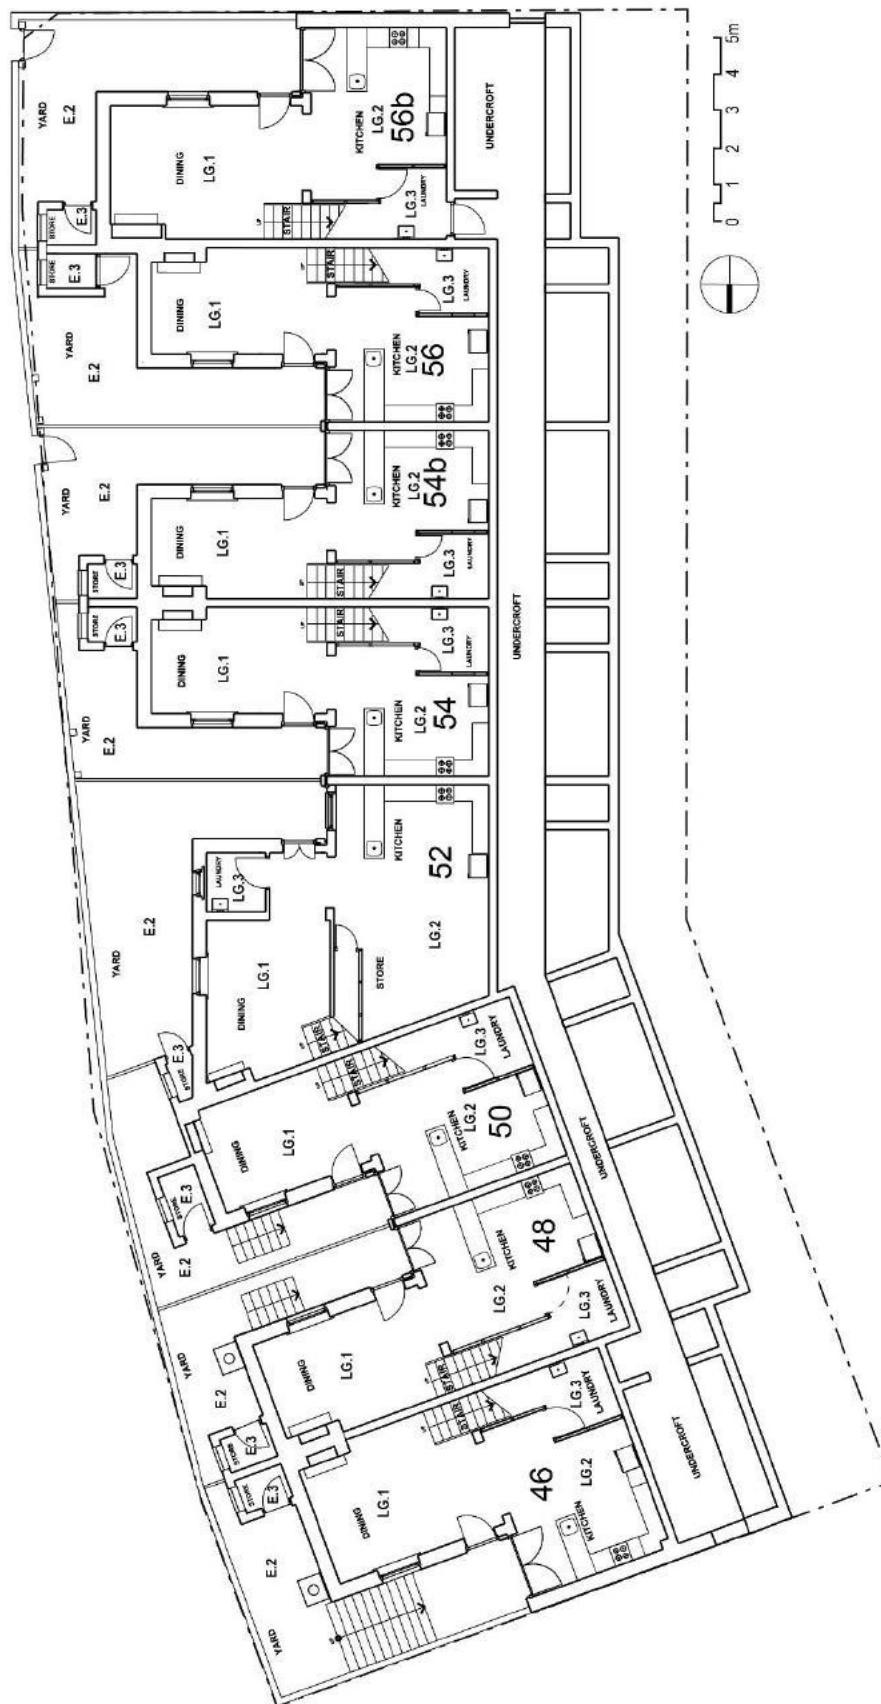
Lower ground floor level plan. (Source: SHFA, amended by GML, 2016)
